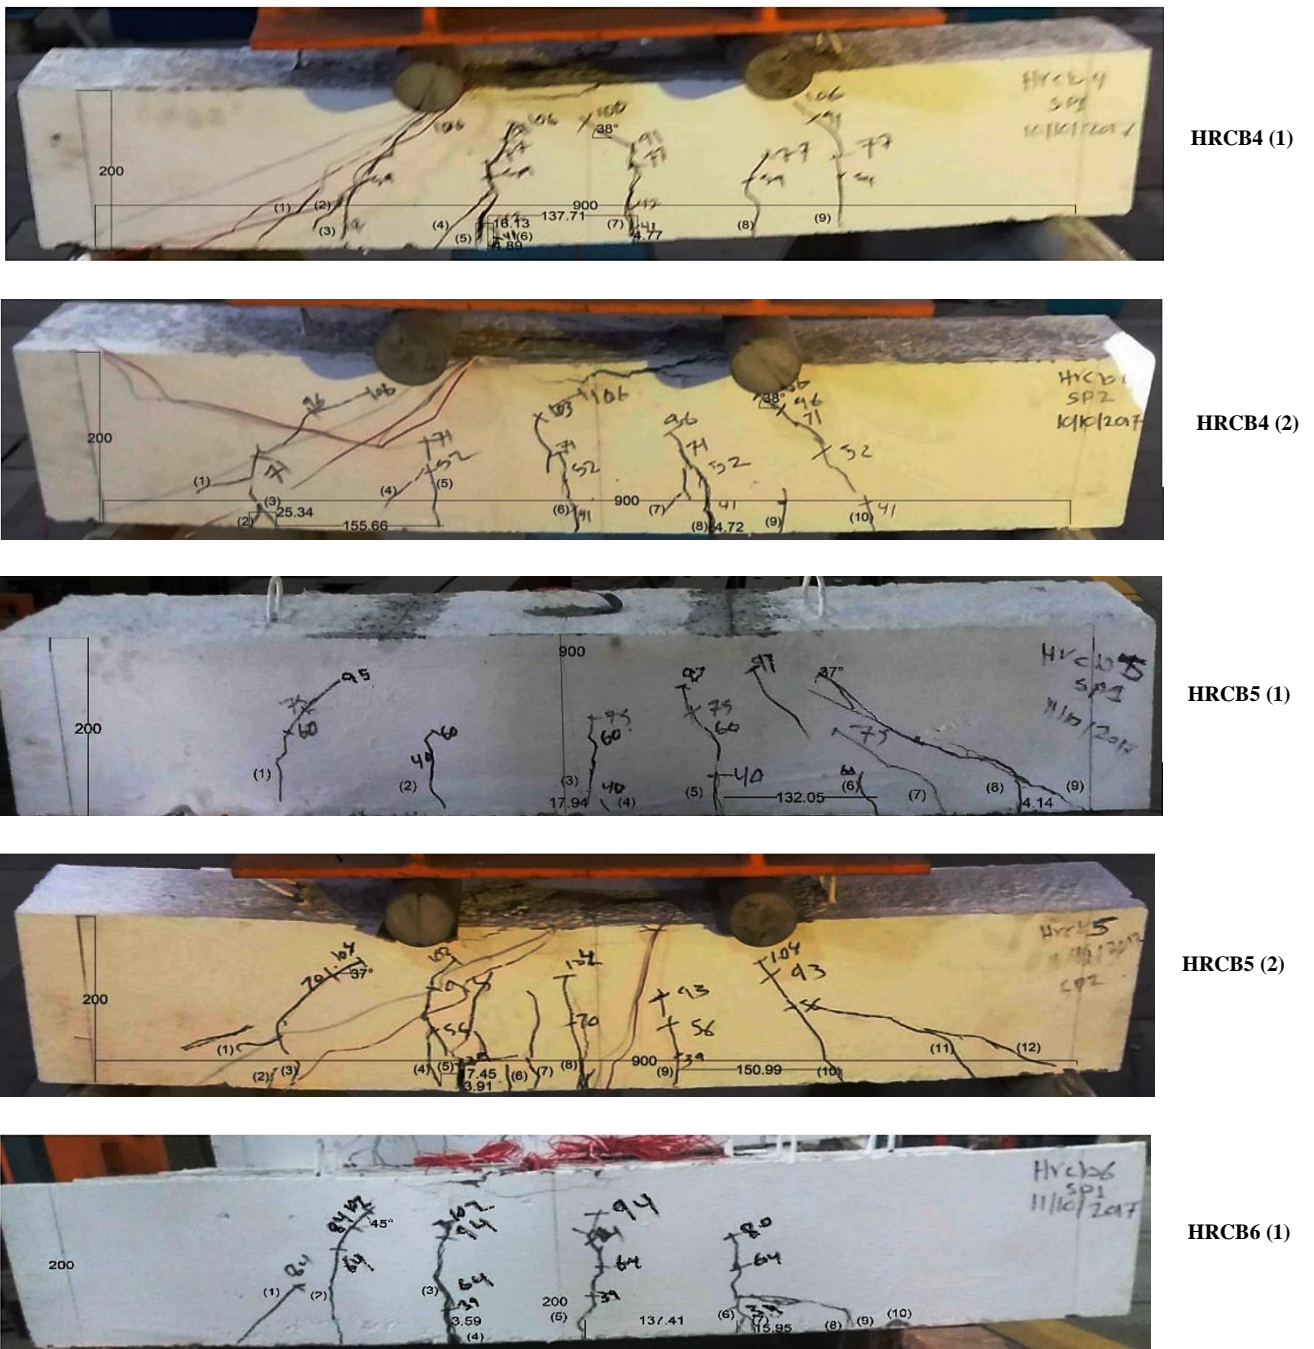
a) Crack behaviour of controlled and rubberized concrete
